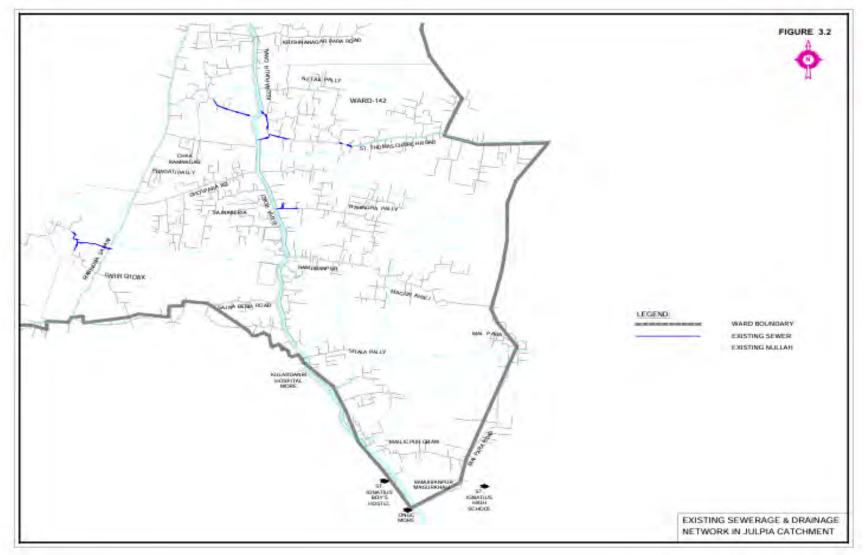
Existing Sewerage & Drainage Network in Julpia Subproject Area
